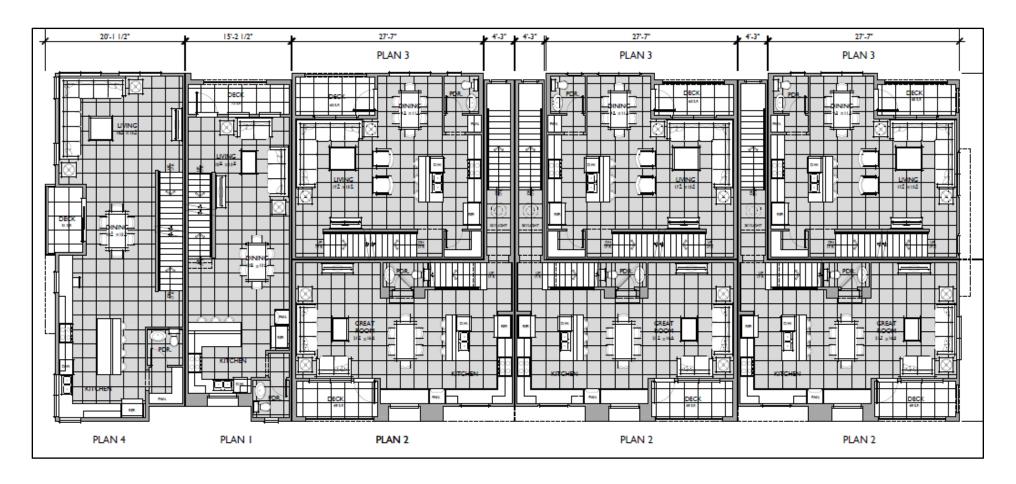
<sup>rd</sup> FLOOR PLAN (6-PLEX TYPICAL)
